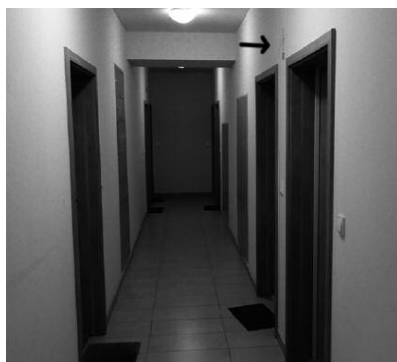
Examples of damage to partition walls as a result of excessive deflection of a floor slab
